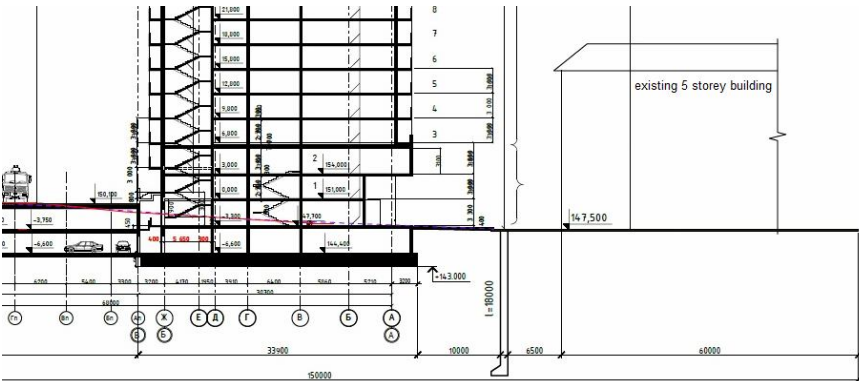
The section of the projected multi-storey residential building and the existing 5-storey residential building
